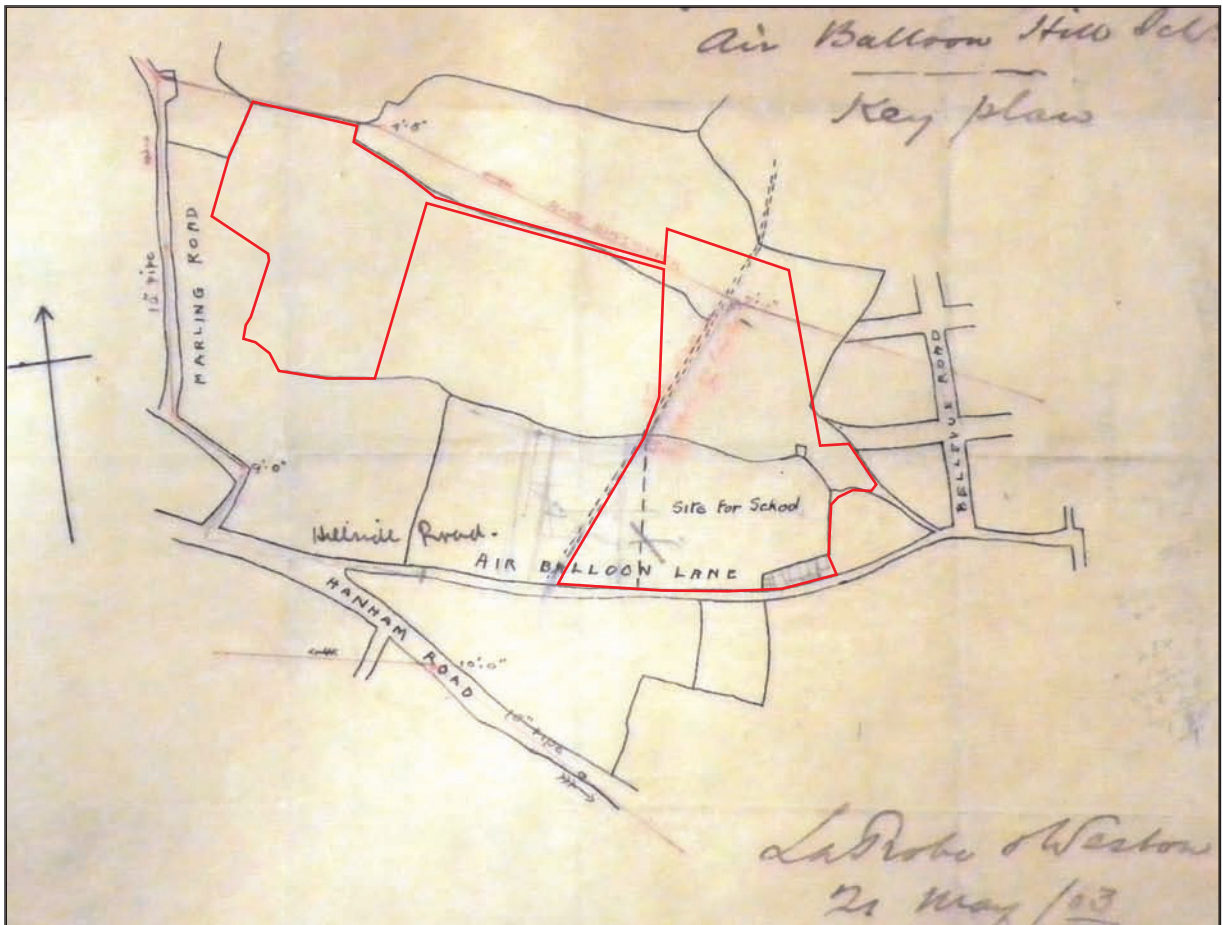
Architects' drawing dated May 1903 showing site of school and routes of main sewers (BRO) Building Plan Book Vol.44 Folio 64
